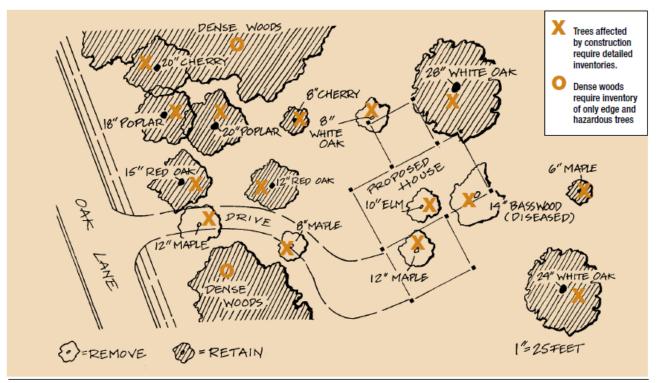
A simple tree preservation plan shows the location of house, driveway, and trees to be removed, encroached upon, and retained. The following guidelines can help you develop a tree preservation plan.
